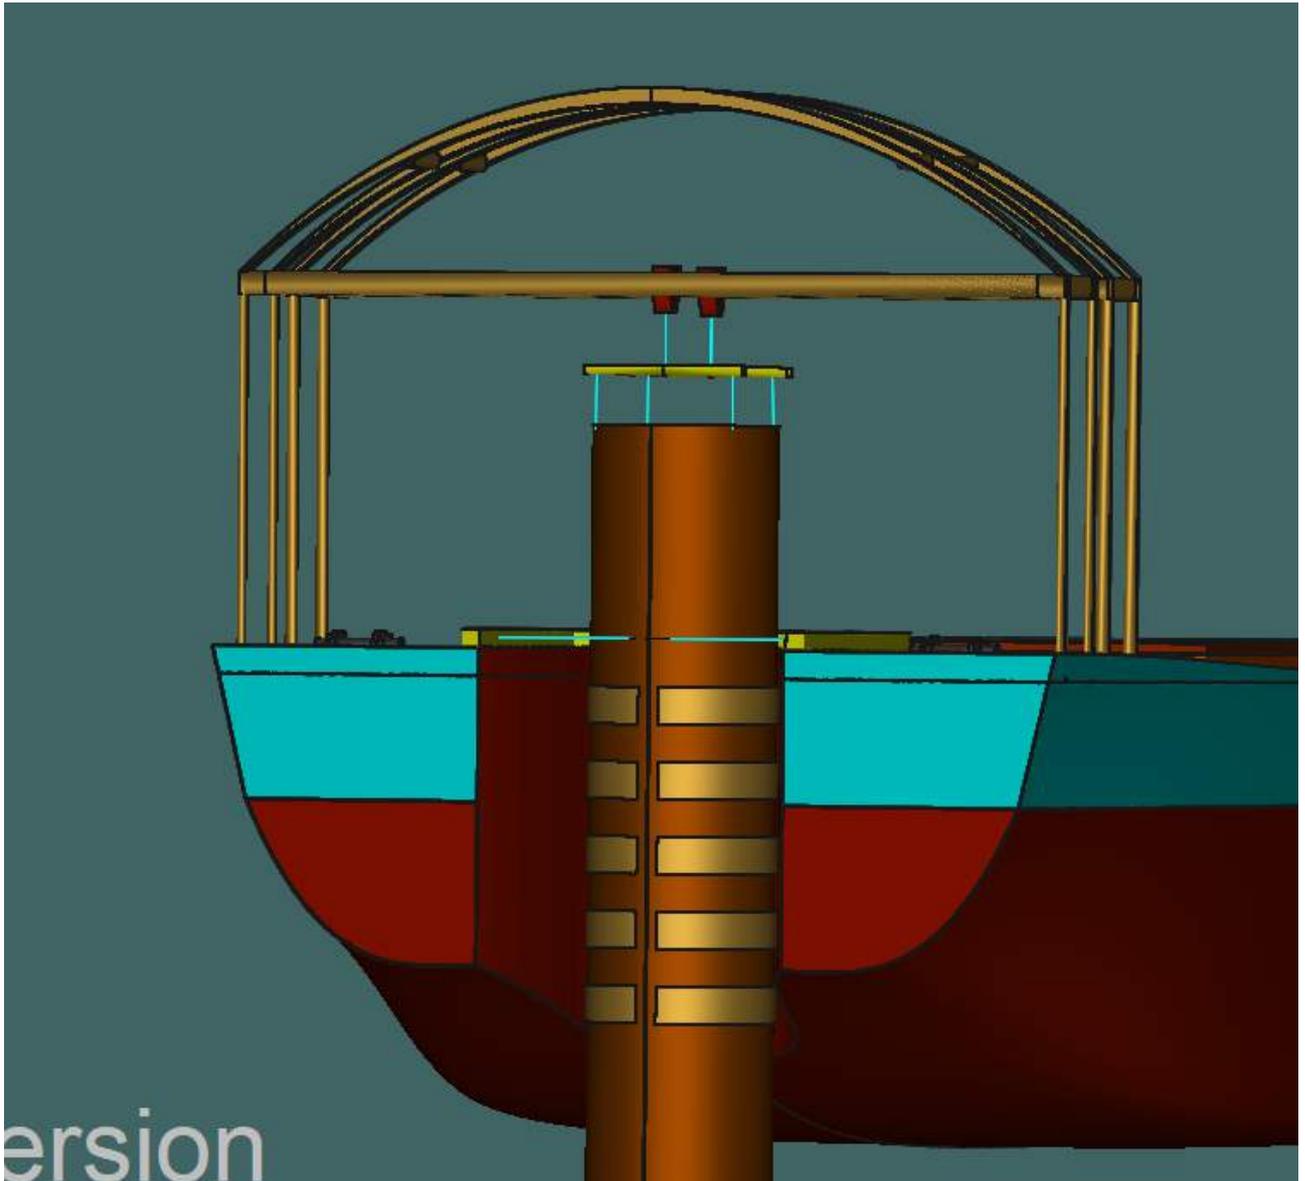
Commencement of Cutting with Diamond Wire Cutter
